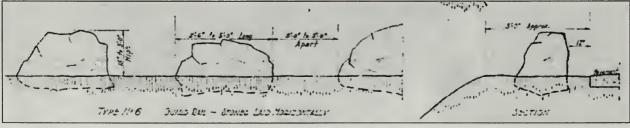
Guardwall detail from Thomas Vint. (Denver Service Center, Guard Rail Types, National Park Road Projects, PG-AP-3)
